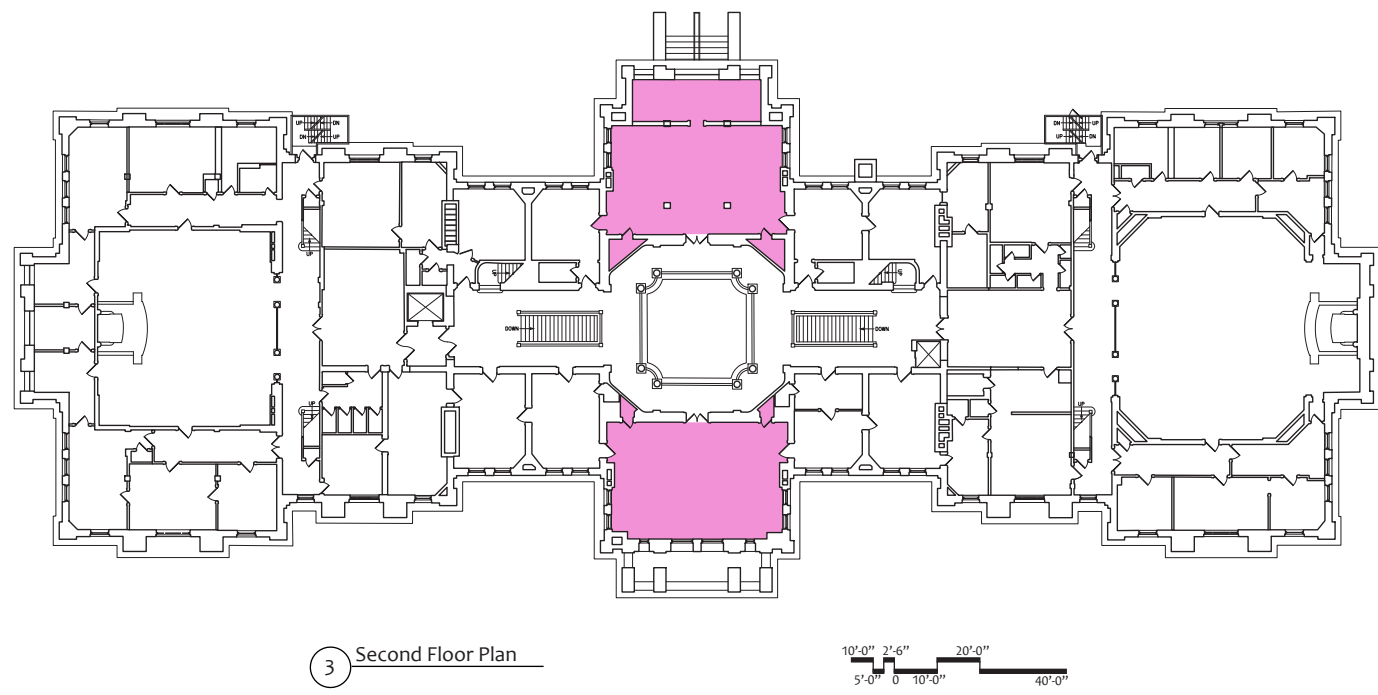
Second Floor Plan of Committee Rooms [highlighted in pink]
